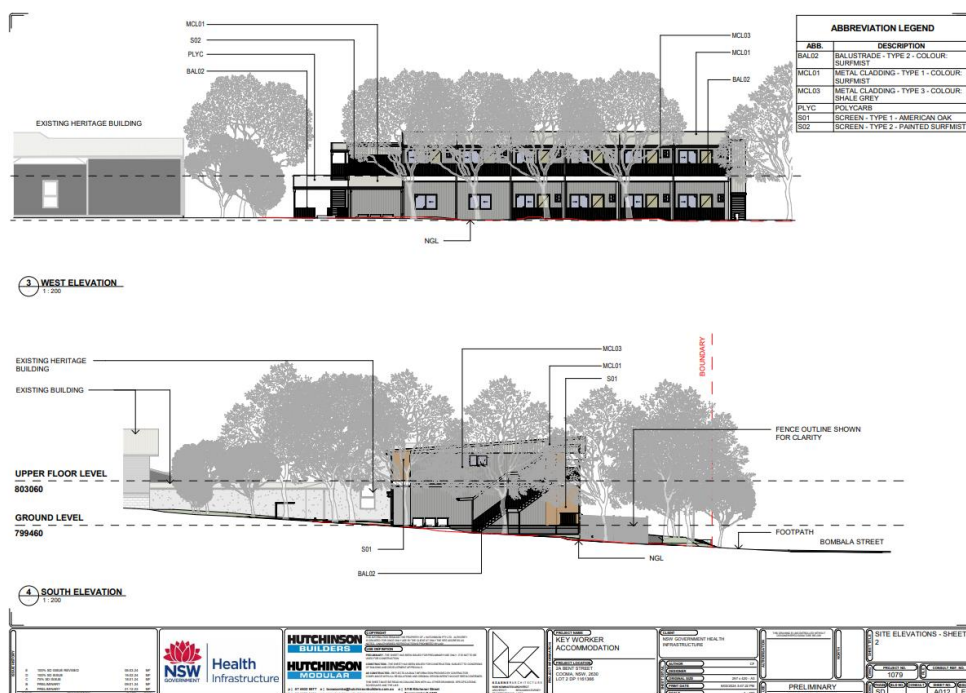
Site Elevations – Sheet 2 (Source: Kearney Architecture)
